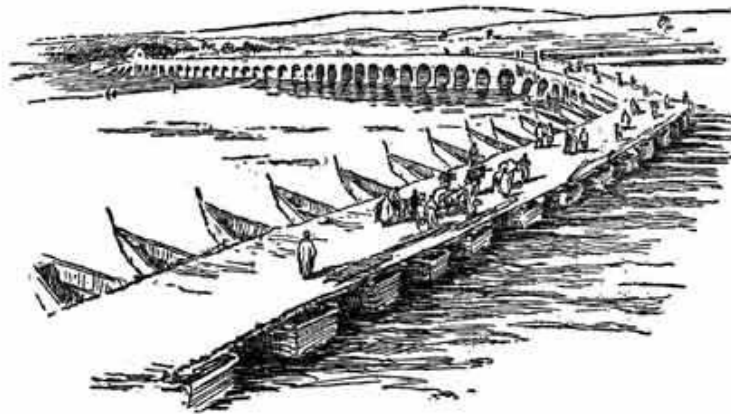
Sketch of Xerxes Bridge (Unknown, n.d.)
